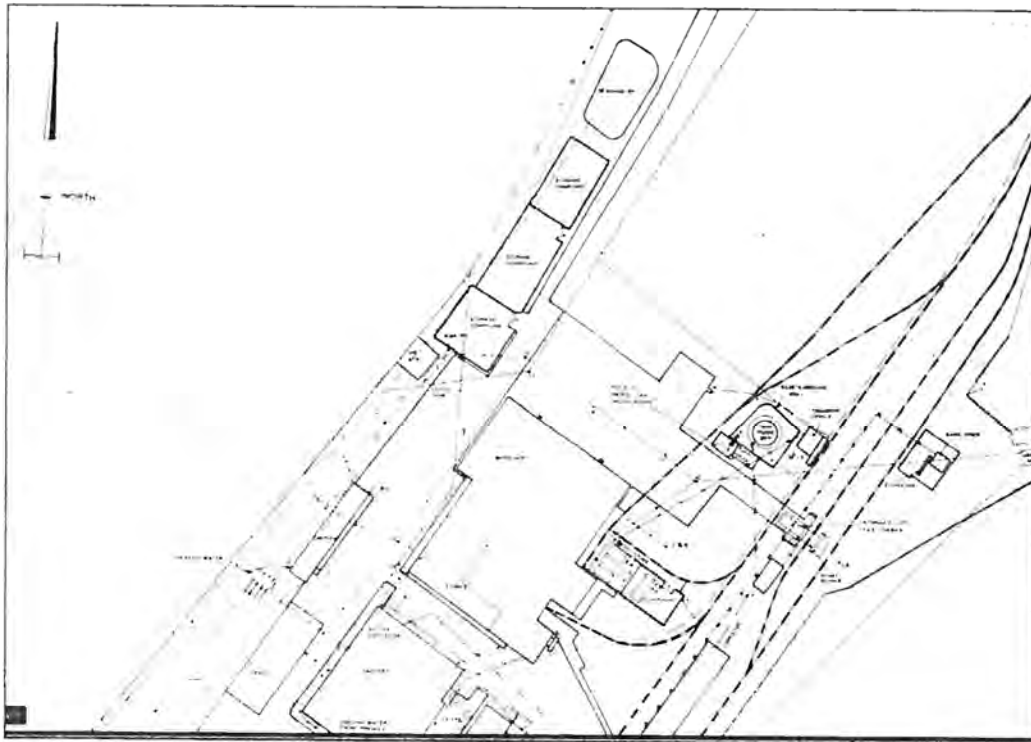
Extract from site layout plan under 98/520 showing the existing layout at that time.
